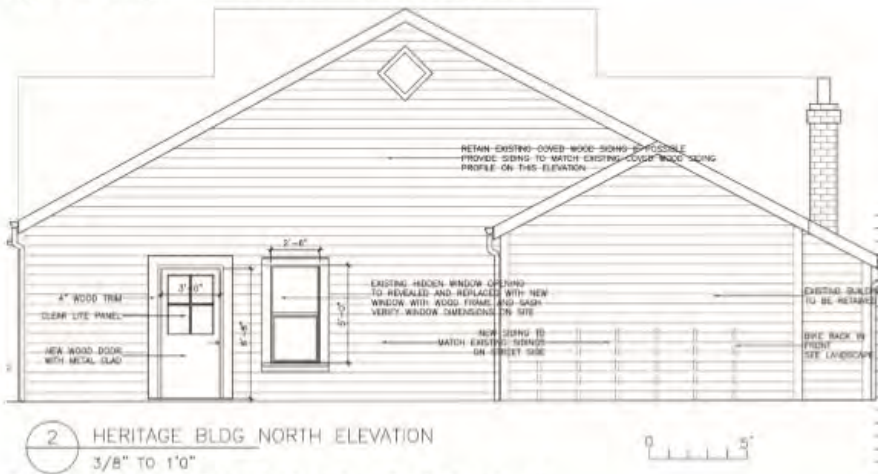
Proposed North Elevation, Ikeda Dry Goods
